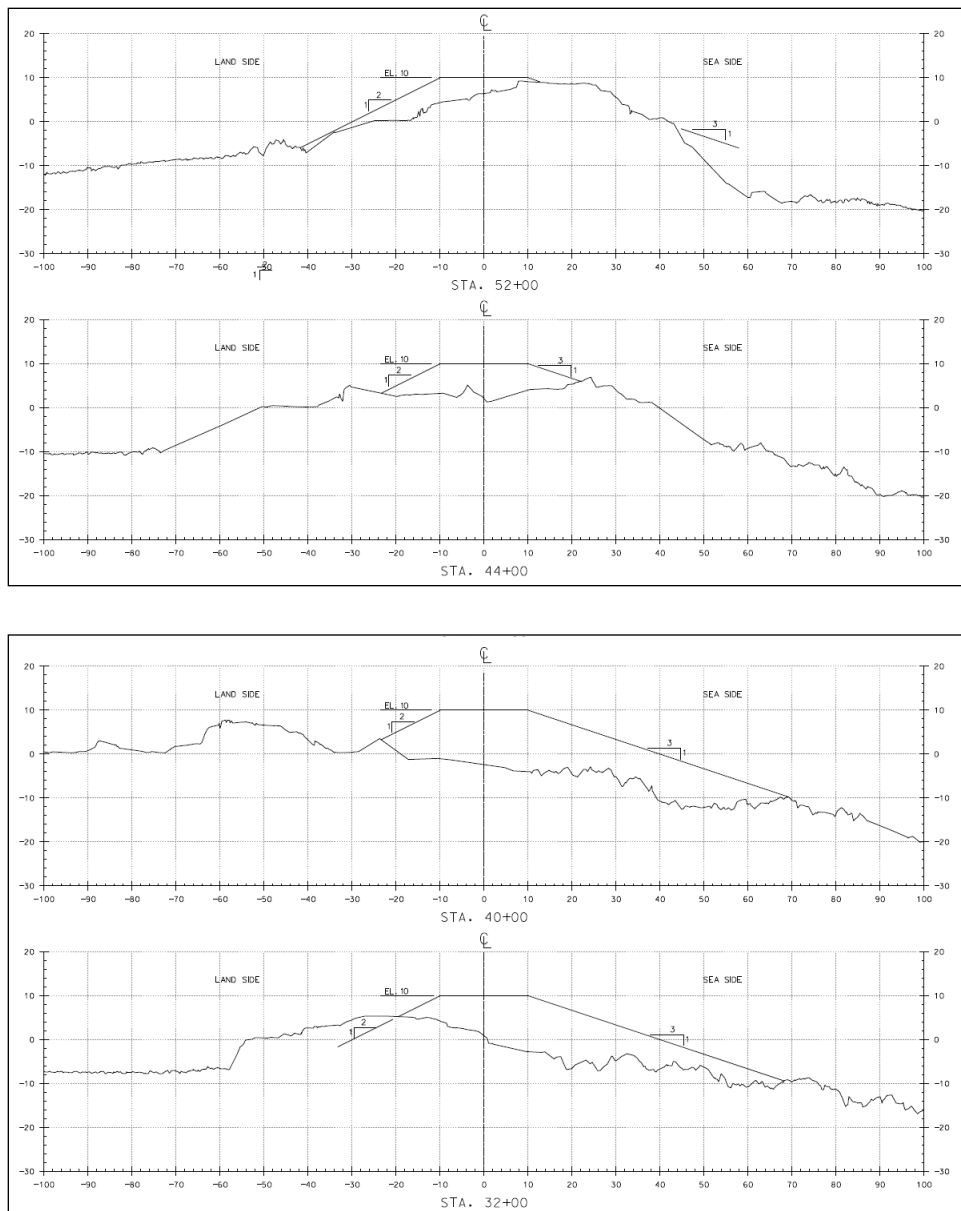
Alternative 3 idealized cross sections on existing damaged sections. Elevations are in feet relative to mllw, and stationing along the horizontal axis is in feet.
